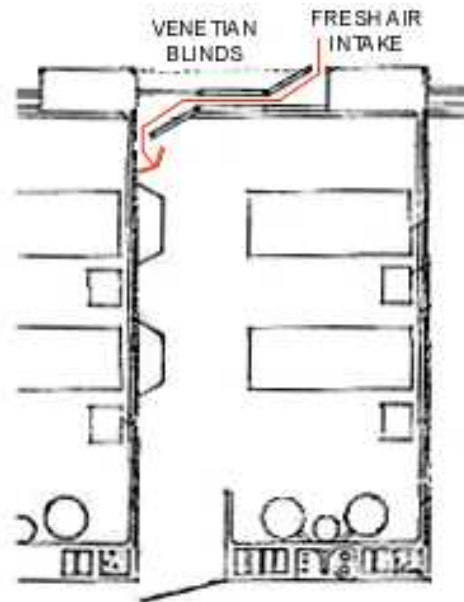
Paimio Sanatorium: Patient Room Plan showing operable windows and ventilation.
